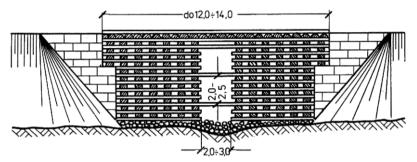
Filling the opening of a damaged bridge using a structure in the form of 'cages' made of railway sleepers (Cholewo & Sznurowski, 1970; Miklin & Sawicki, 1993)
